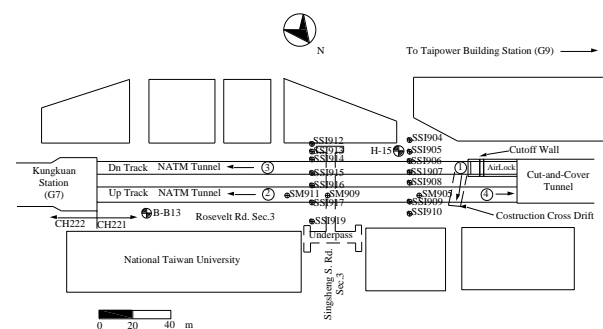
Location of tunnels bored with New Austrian Tunnelling Method.
